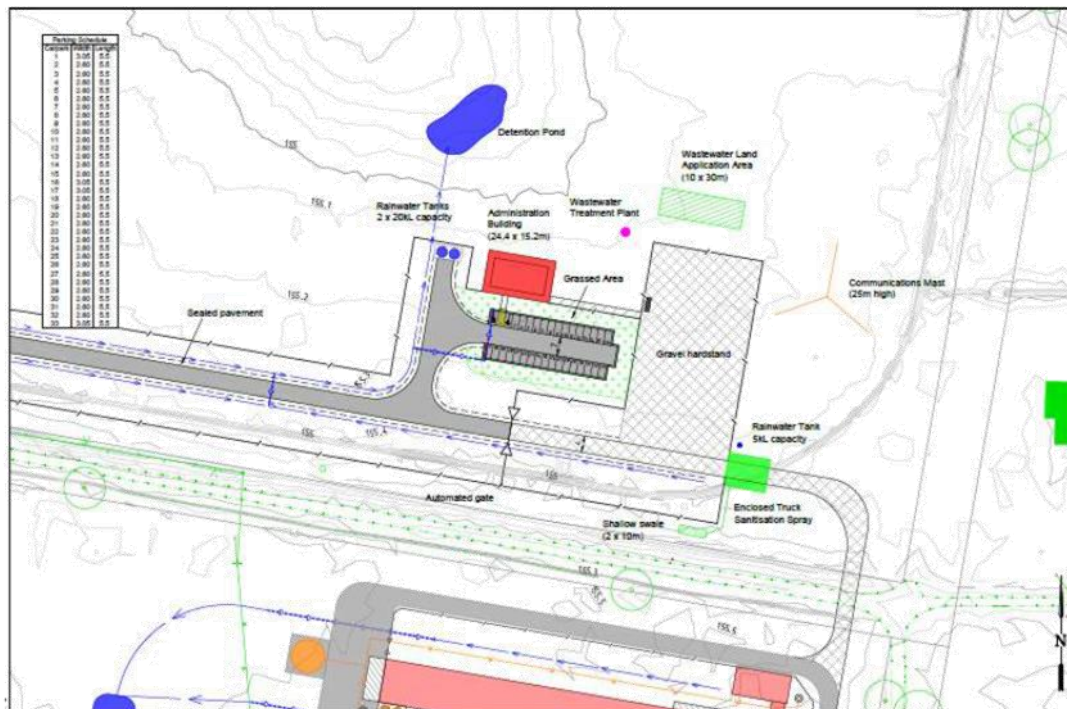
Administration Building Layout Plan (Source: Application Plans)
